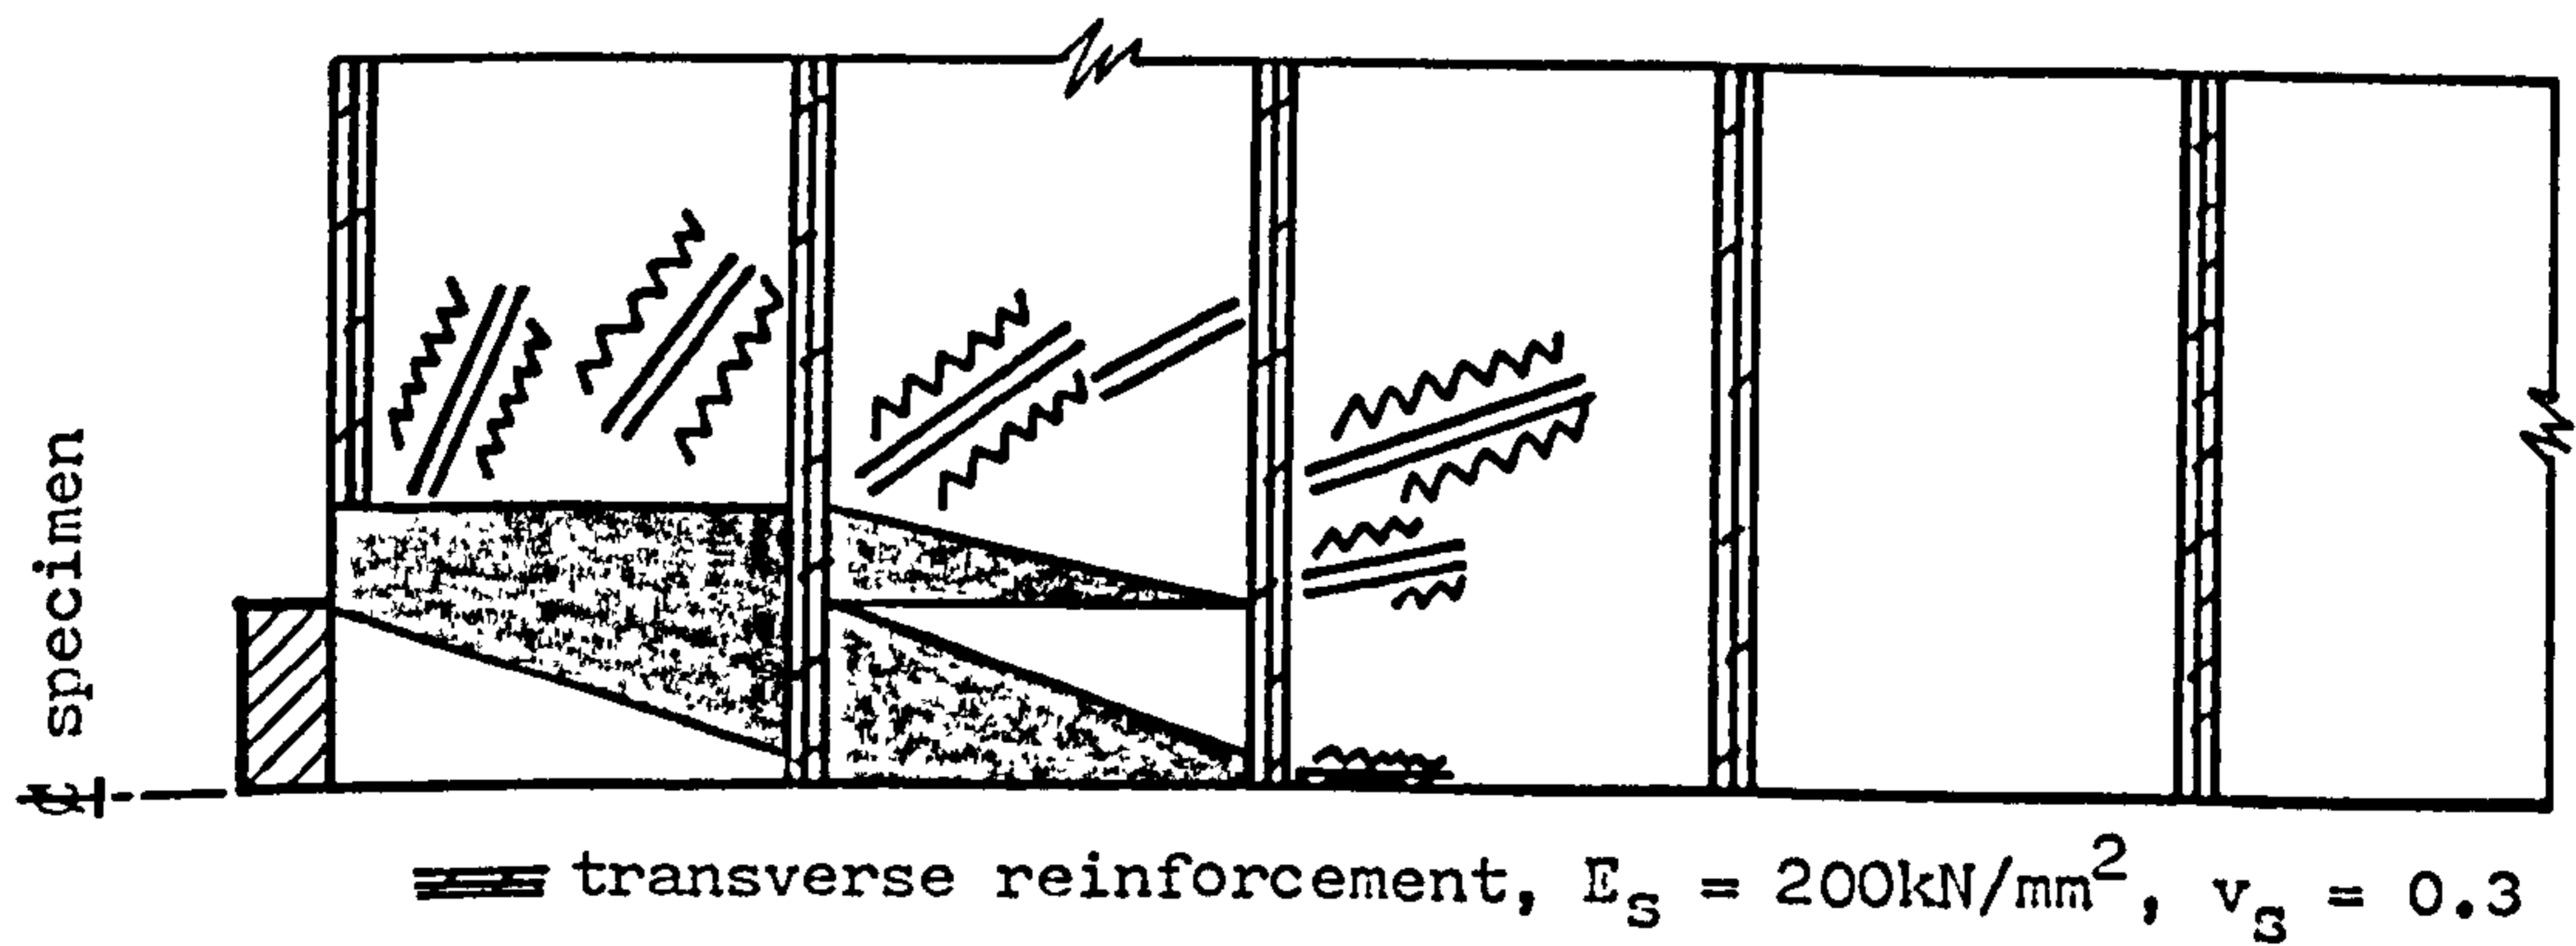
Distribution of the concrete failure in a reinforced prism subjected to a strip load.
